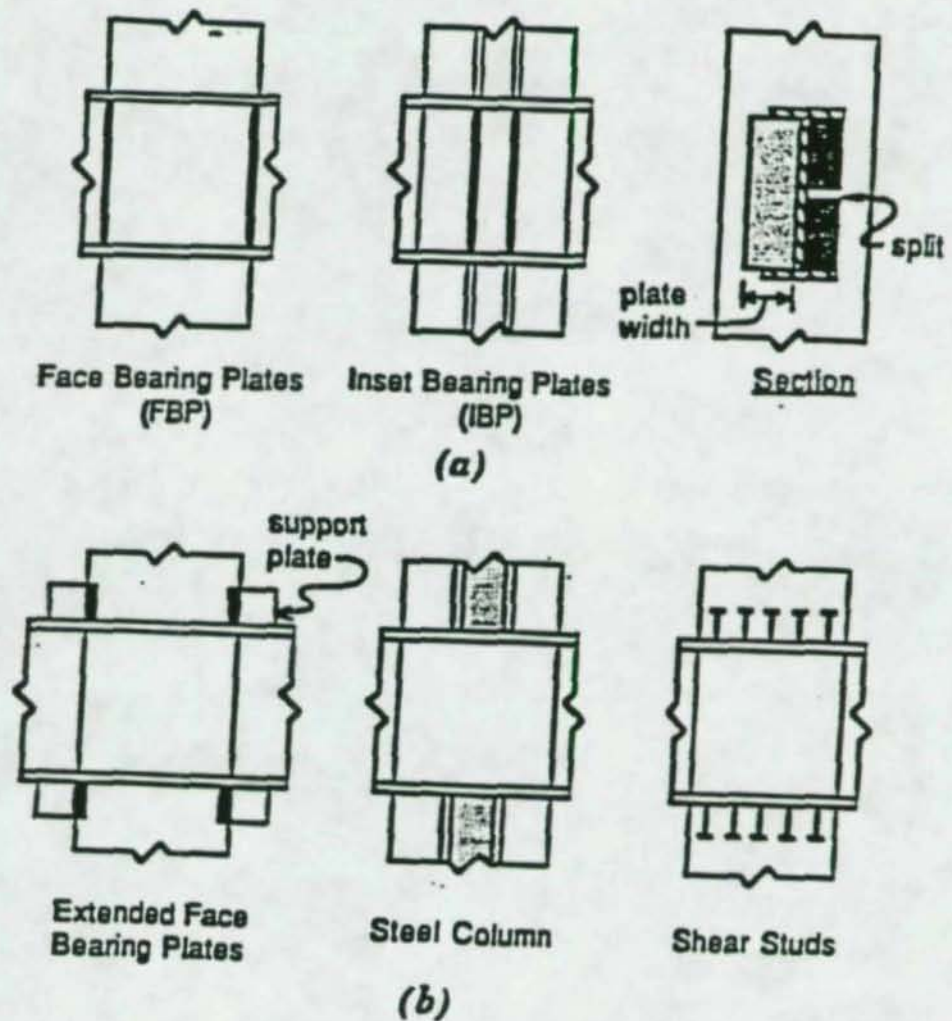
(a) Bearing (stiffener) plate detail; (b) Extended FBP, Steel column and Shear stud detail used by Sheikh<sup>(22,23)</sup>
